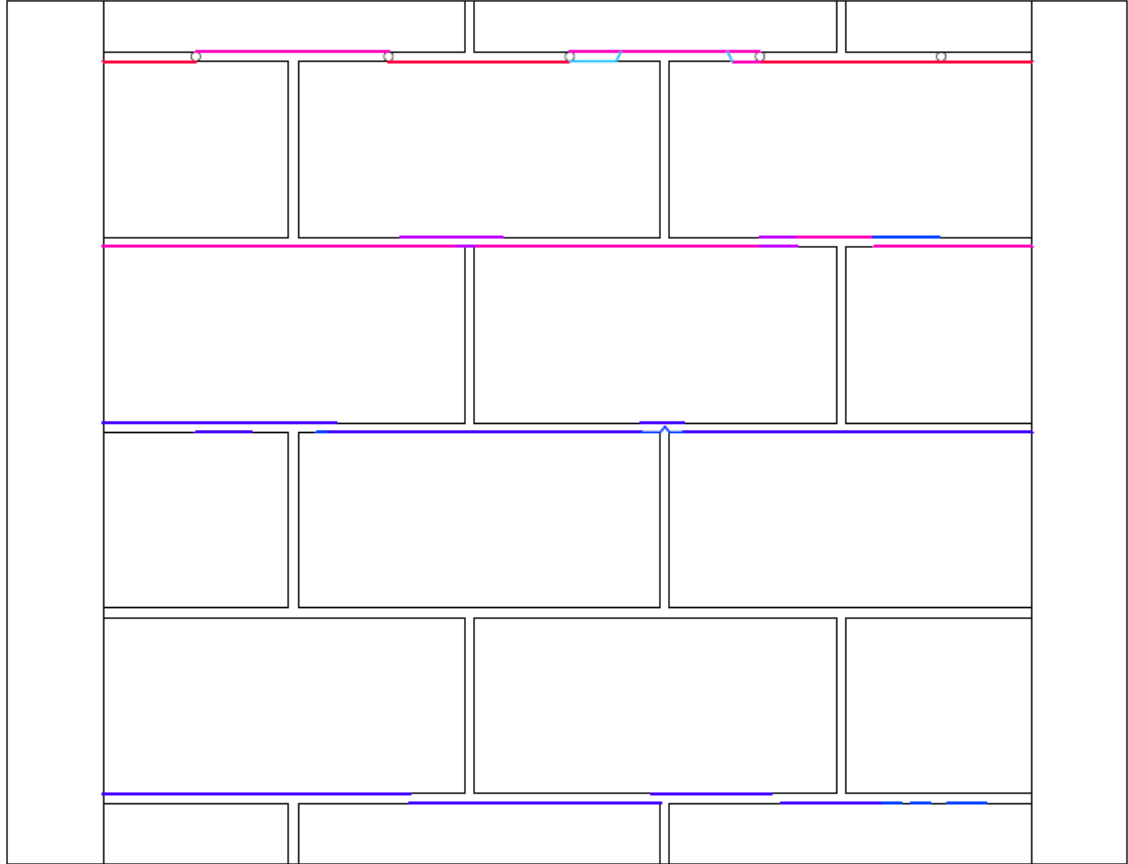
Close-up of Crack Pattern of C-3 3m Wall
